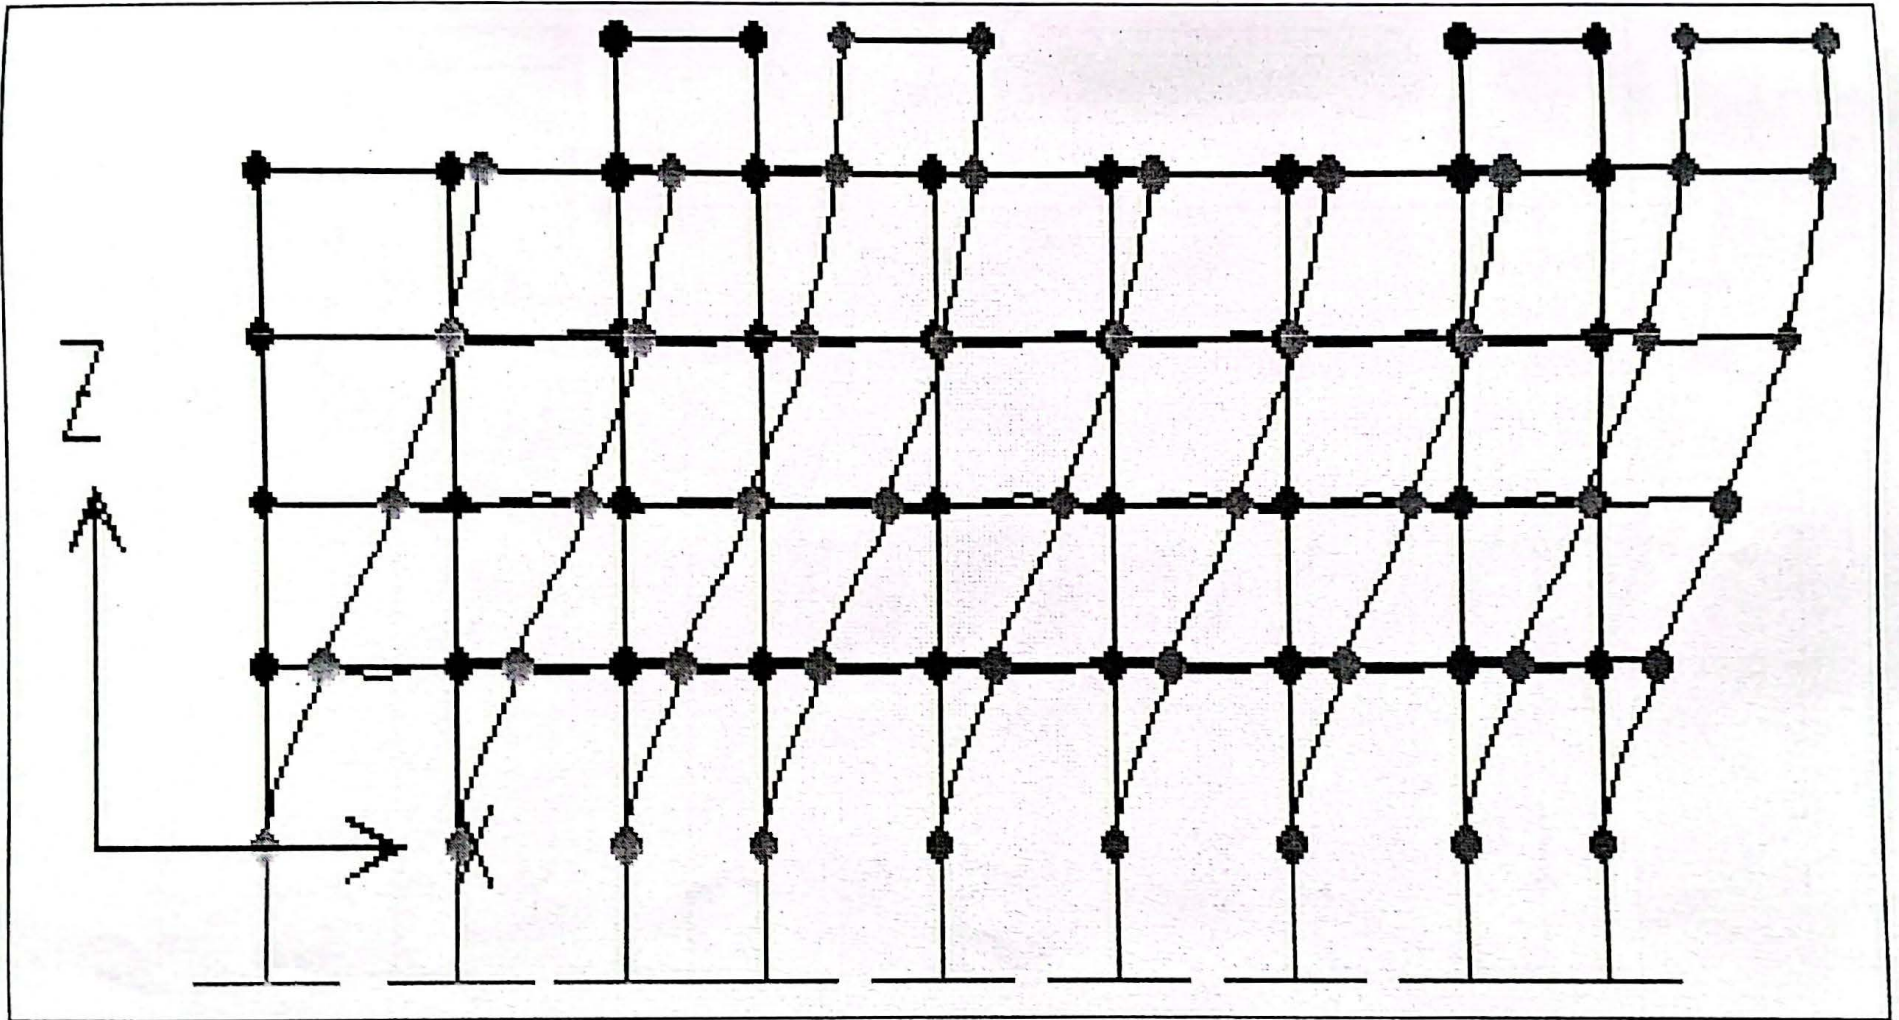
SHOWING DEFORMED SHAPE IN FRAME A-A DUE TO EPQX
